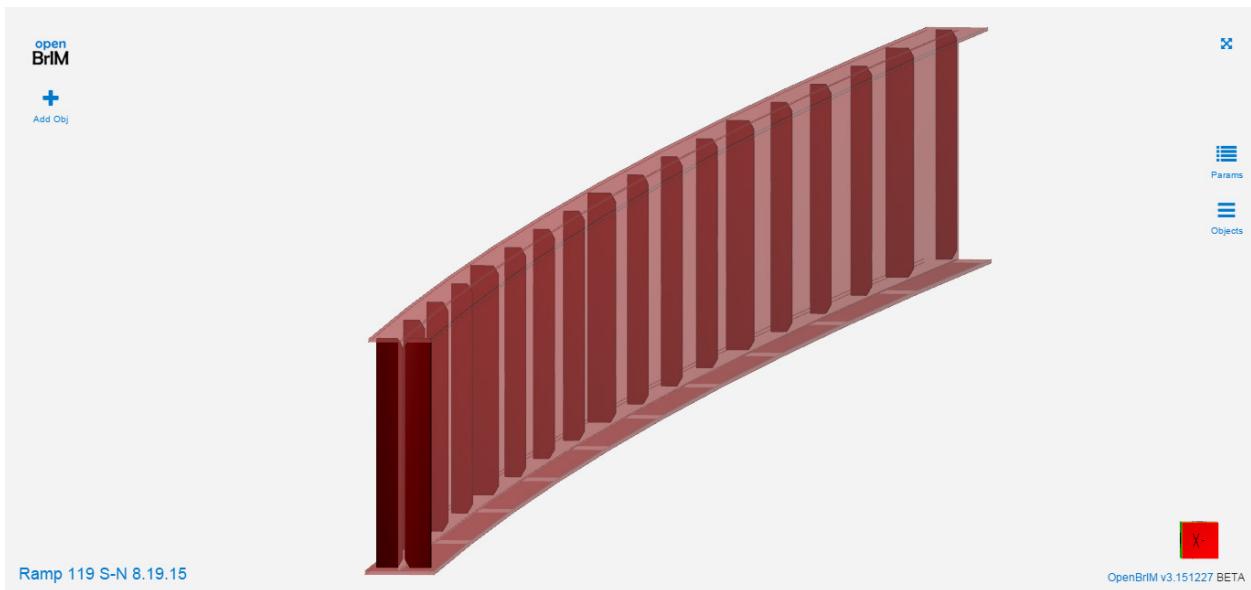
Ramp 119 S-N Girder 1 Field Section 1
